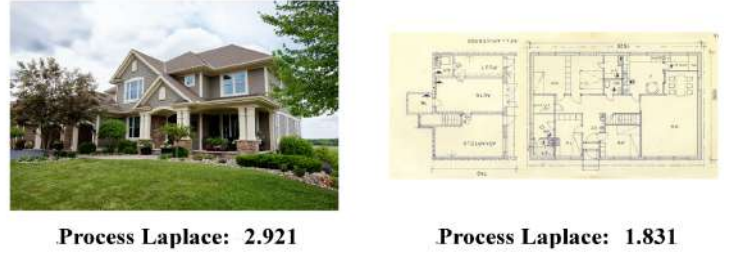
Variance of laplace operation of a Non Floor Plan and Floor Plan image
